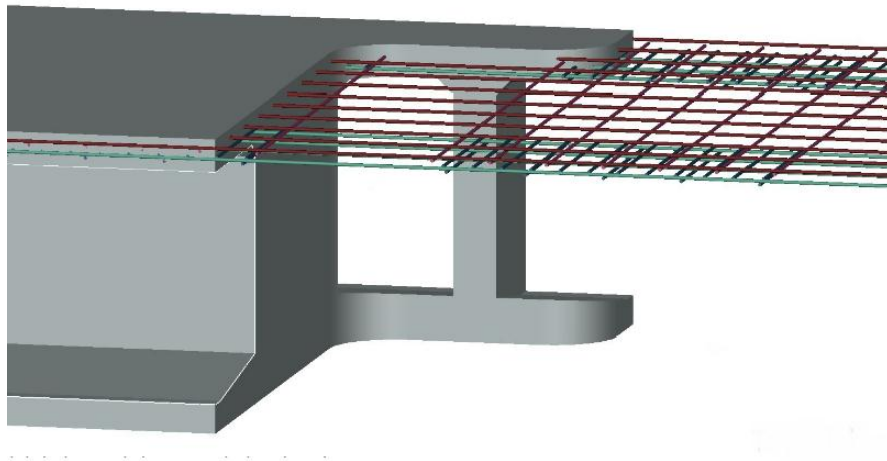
Integral Bent Cap Top Slab Reinforcement
